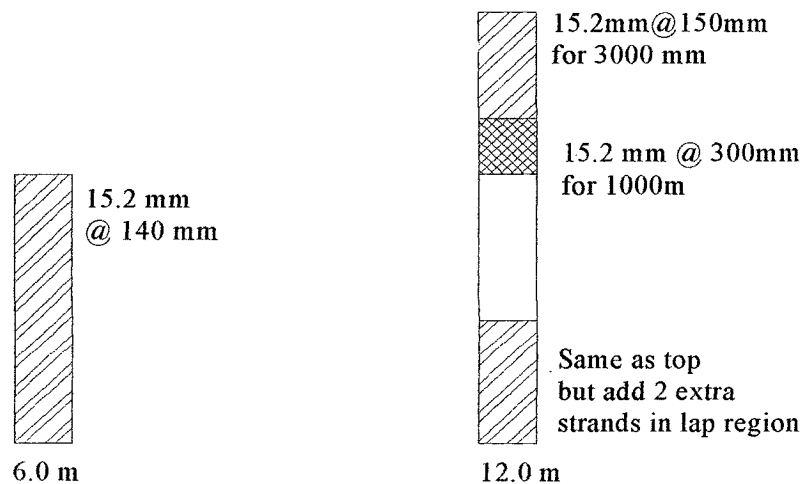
Details of Retro-belt design for 2000 mm circular columns with 6.0 m and 12.0 m lengths
